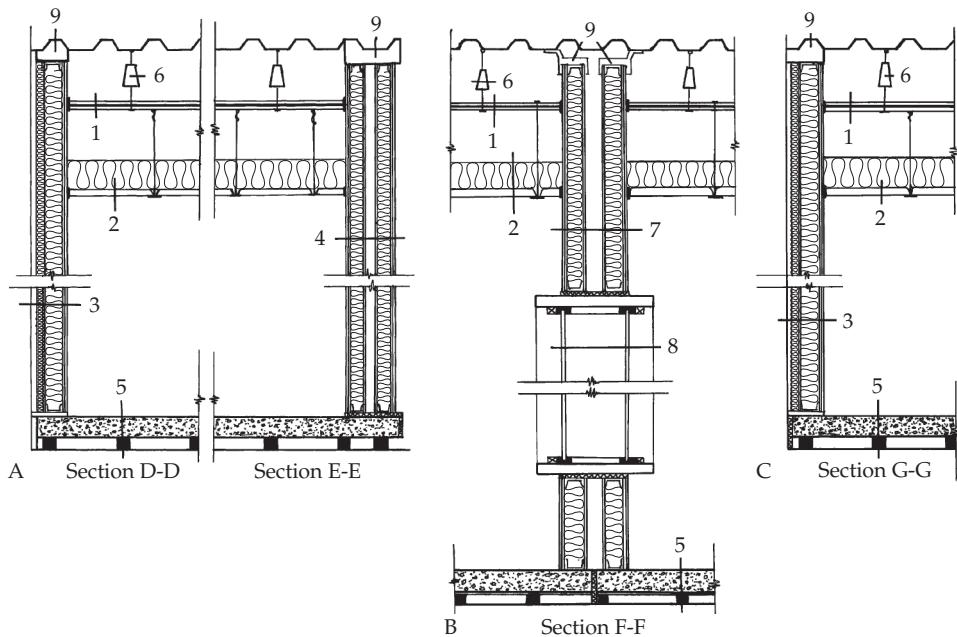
Wall sections of a large recording studio. (A) Sections D-D and E-E, exterior and interior walls. (B) Section F-F, interior wall between studio and control room. (C) Section G-G, exterior wall.
